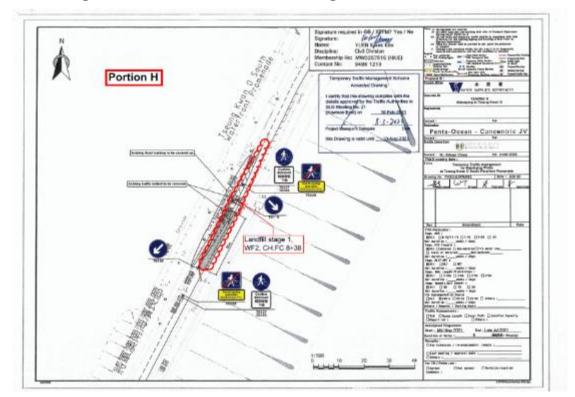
Location Plan – Landfill Stage 1 (Area FC8+38)
